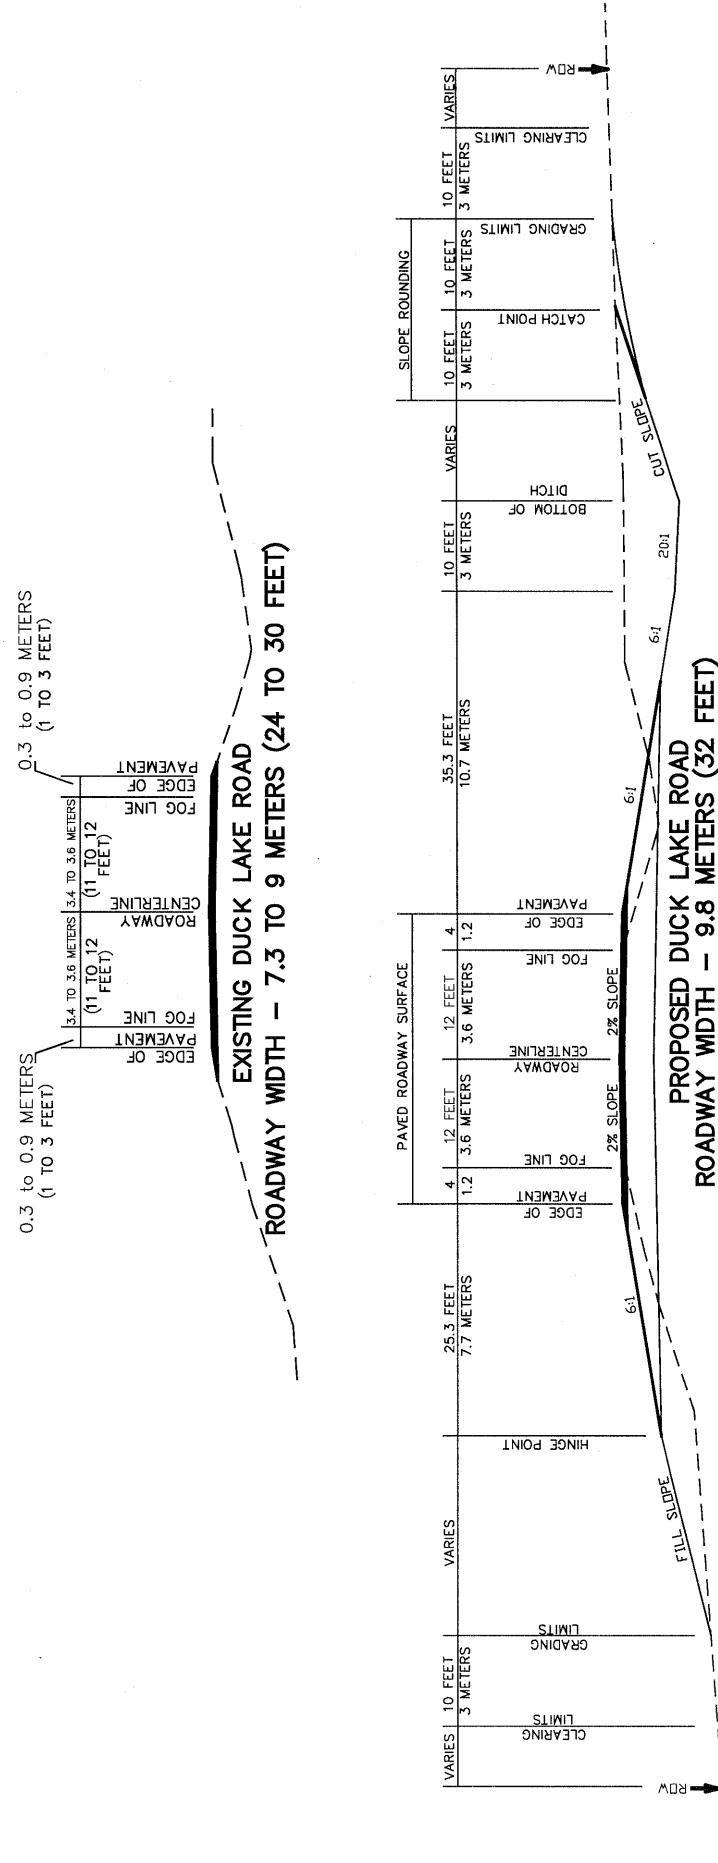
Typical cross-sections of the existing and proposed lane configurations for Duck Lake Road.
